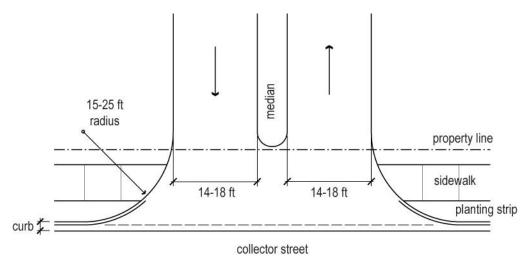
Multifamily/Nonresidential Driveways, collector street (median-separated)
